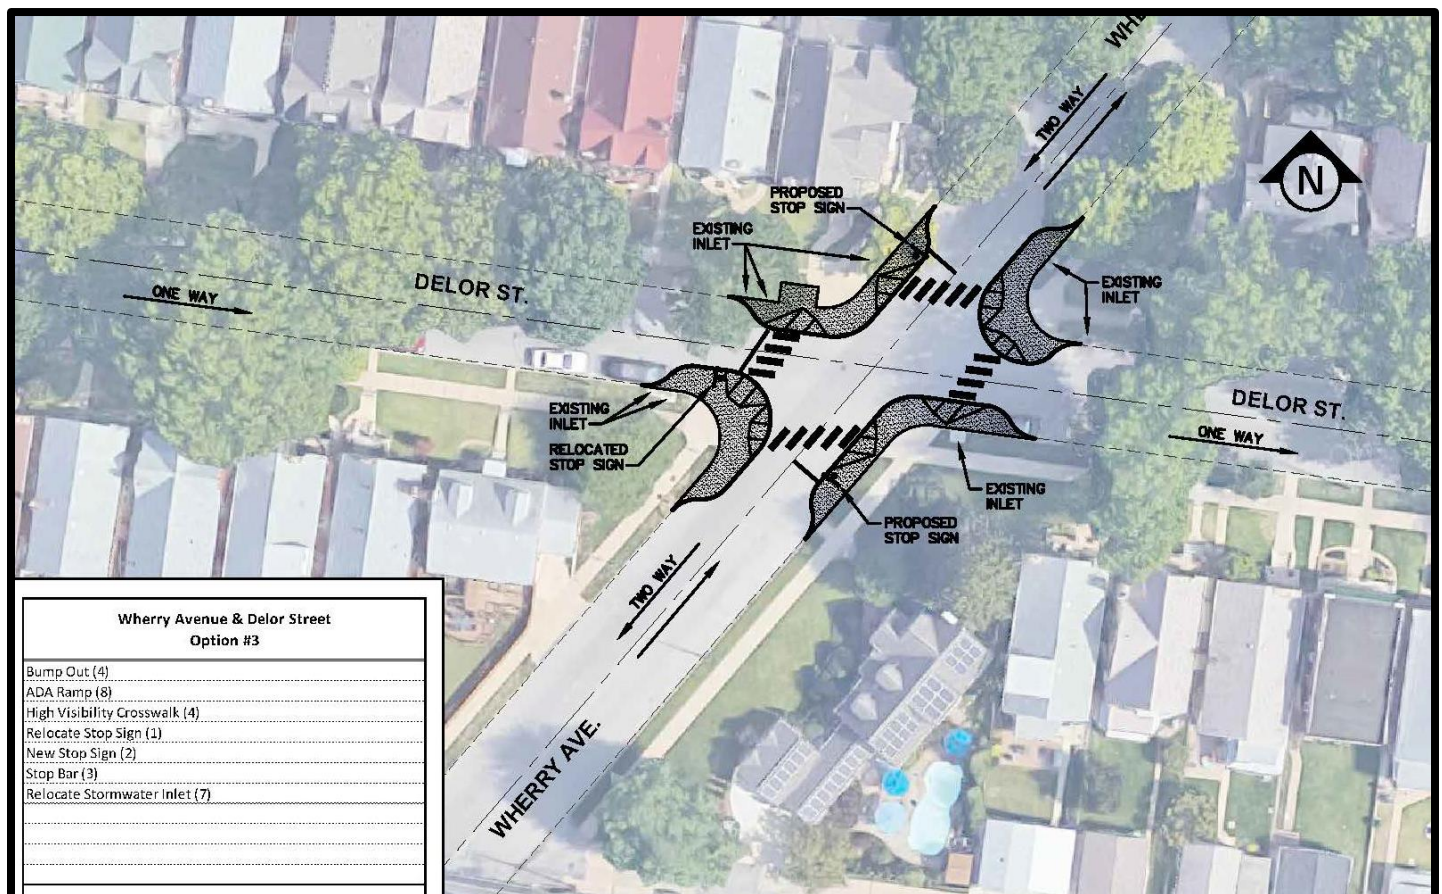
Curb extensions, crosswalks, and reconfiguration to 4-way stop at Wherry Ave. and Delor St.
